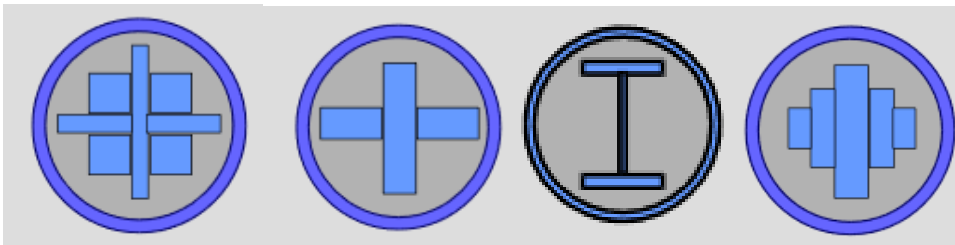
Concrete filled section with steel section ( Source: G. Hansville: Eurocode 4 composite columns. [14].)
